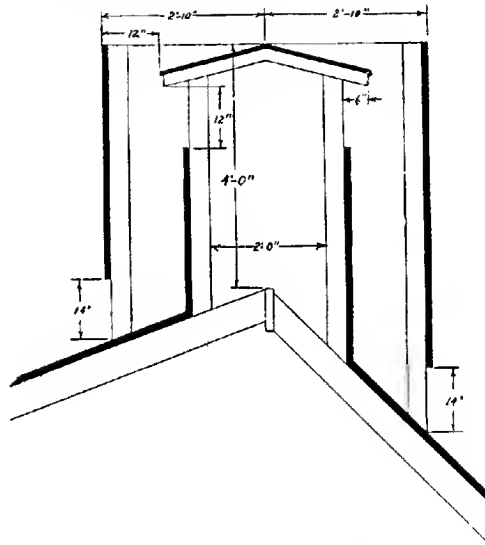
Fig. IV.—Details of construction of double-walled ventilator. Warm air escapes from the shaft through the continuous opening 12 inches in width at the top of the inner wall; the opening at the bottom of the outer wall permits cold air to enter and pass up between the walls, assisting the draught, while the upper portion of the outer wall keeps snow or rain from blowing into the shaft.
